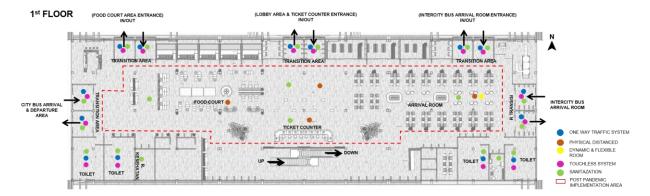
Bus Terminal 1st Floor Plan (Author, 2025)
